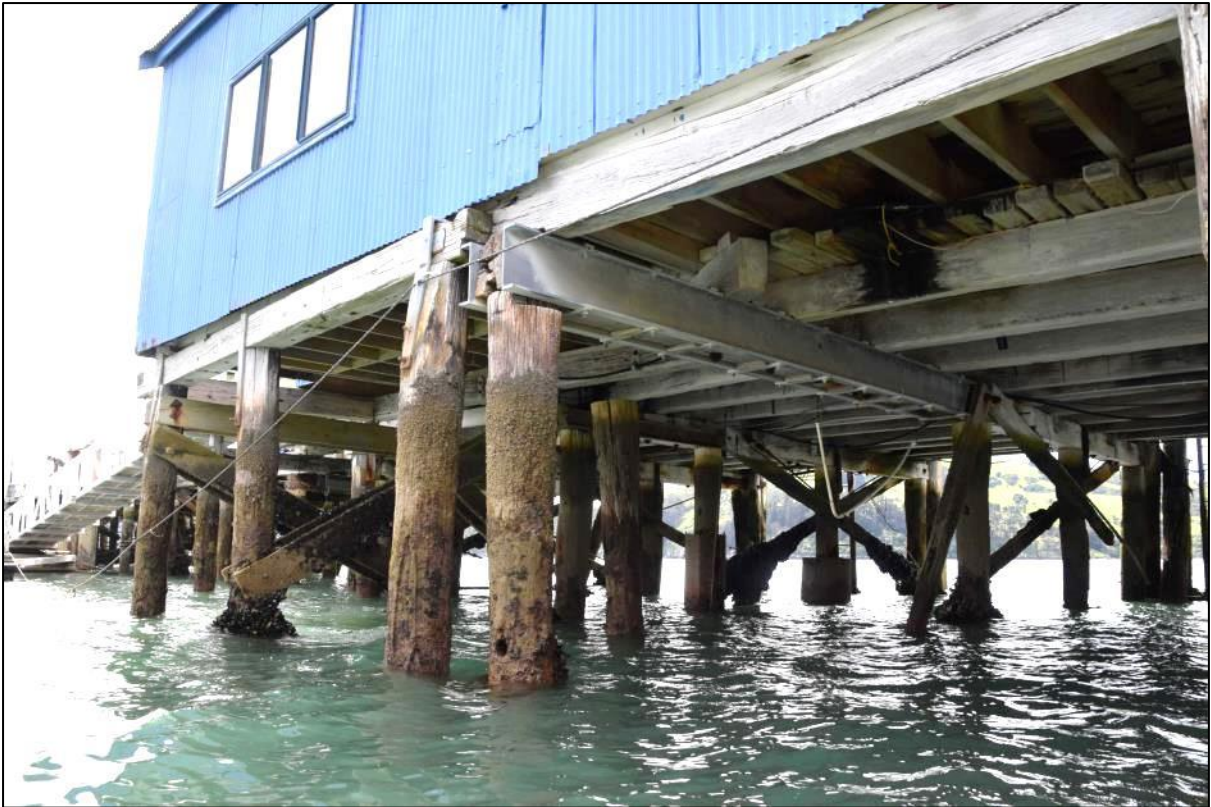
Steel beams either side of a pile cap. It is possible that the short section of diagonally-laid timber beam (cut face towards the camera) on top of the steel strengthening is where the original wharf structure narrowed at the end of the former wharf sheds.
